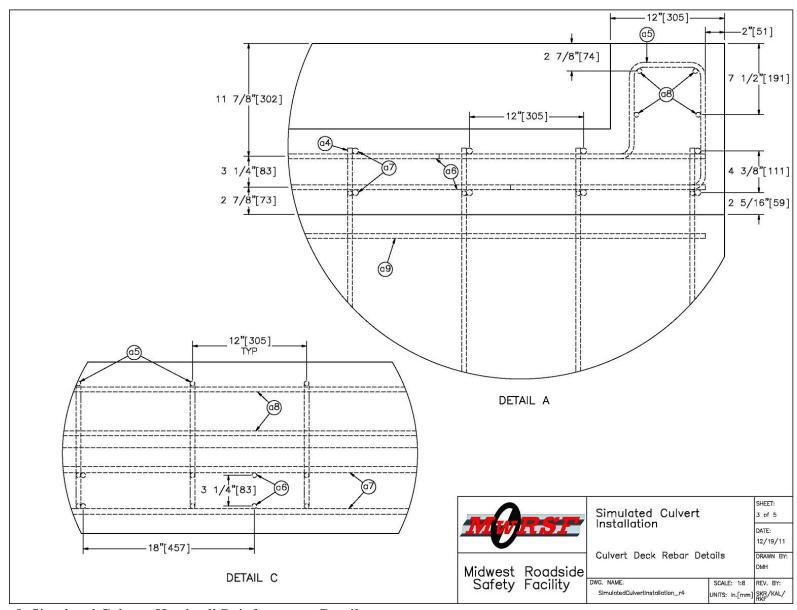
Simulated Culvert, Headwall Reinforcement Details
